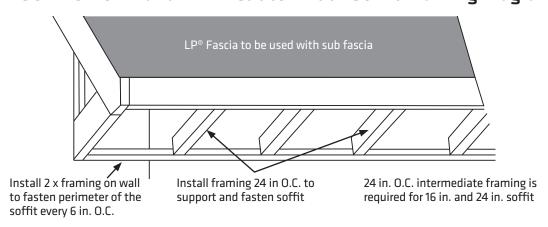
12 in. Cut to Width Soffit Nailing Diagram
